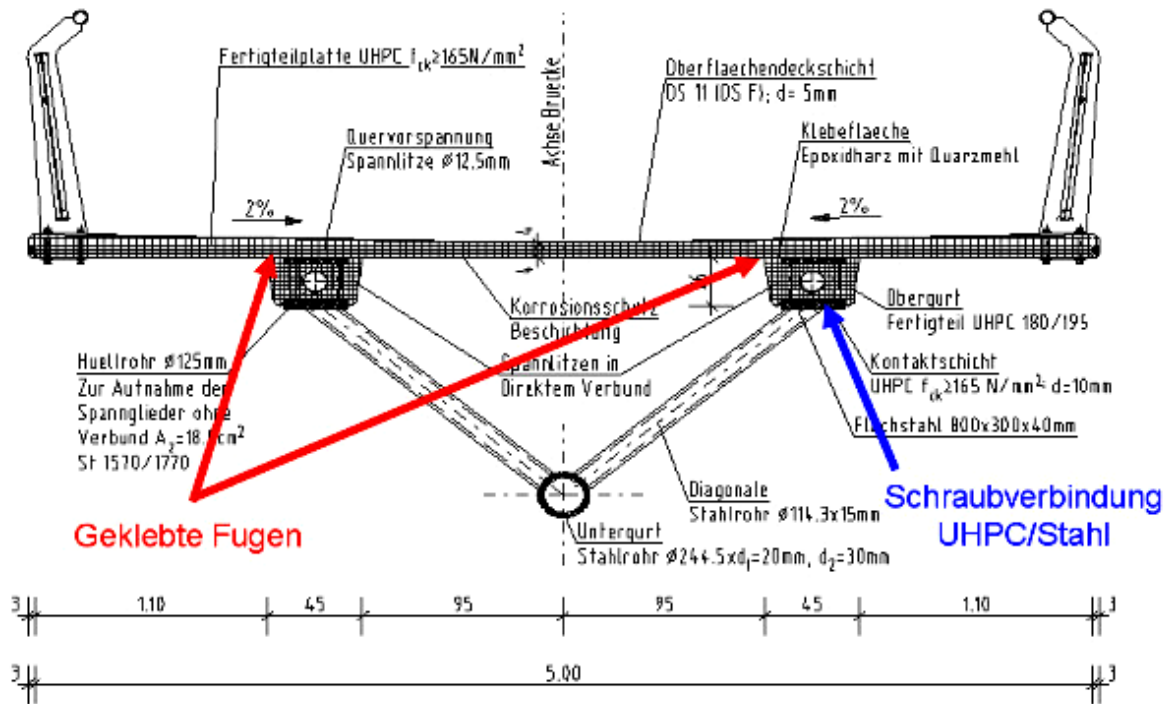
Cross section of the Gärtnerplatz Bridge in Kassel (Germany) [26]
